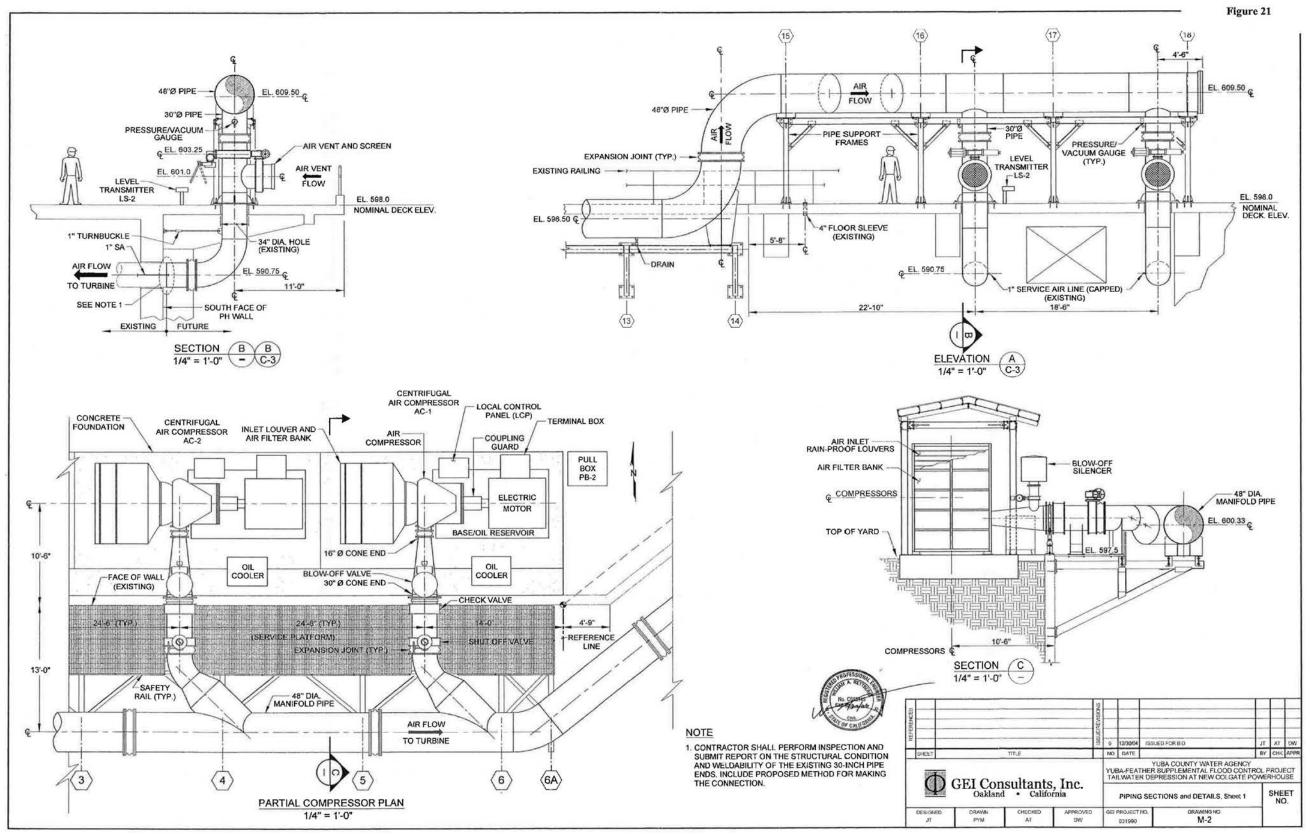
Piping sections and details for YCWA's proposed New Colgate Powerhouse TDS.
